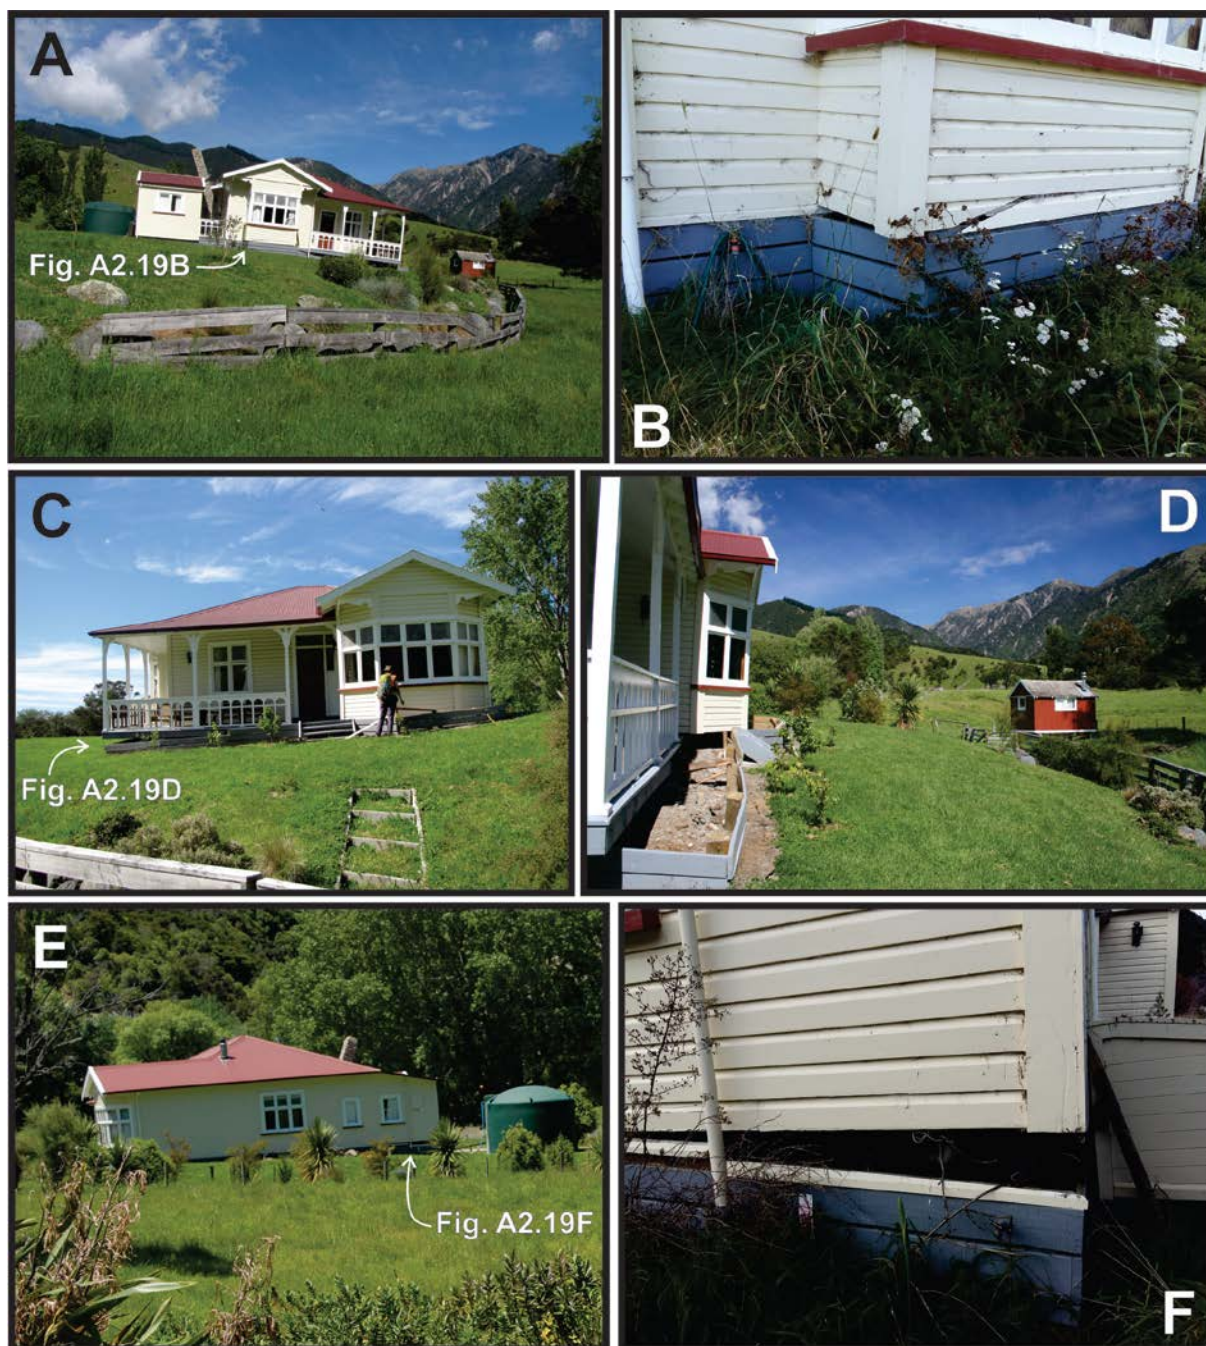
Harkaway Villa and Papatea Fault surface rupture. (A) View looking west showing northeast-ward tilt of the villa on the up-thrown (hanging-wall) side of the Papatea Fault. Photo by Julie Rowland, taken in November 2016. (B) View looking northwest showing detail of damage to the east side of the villa. Photo by Julian Garcia-Mayordomo, taken about 18 months after the 2016 Kaikōura earthquake. (C) View looking south of the north side of the villa. Photo by Rob Langridge, taken in November 2016. (D) View looking west of the north side of the villa, showing offset of the foundation piles from the superstructure. Photo by Julie Rowland, taken in November 2016. (E) View looking east of the west side of Harkaway Villa. Photo by Rob Langridge, taken in November 2016. (F) View looking east, showing detail of damage to the west side of the villa. Photo by Julian Garcia-Mayordomo, taken in May 2018.
